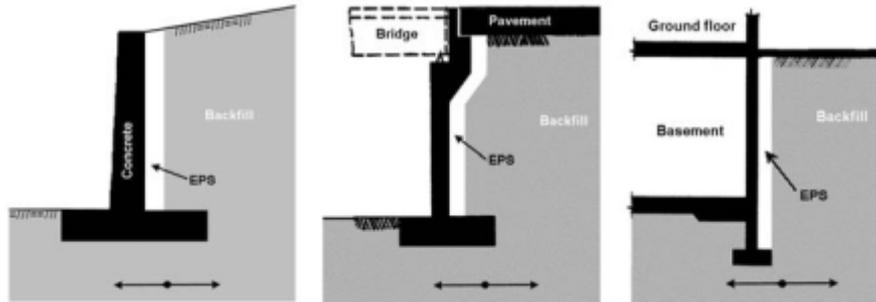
Sketch showing various retaining structures (i.e. retaining wall, bridge abutment and basement wall) with EPS being a compressible inclusion
